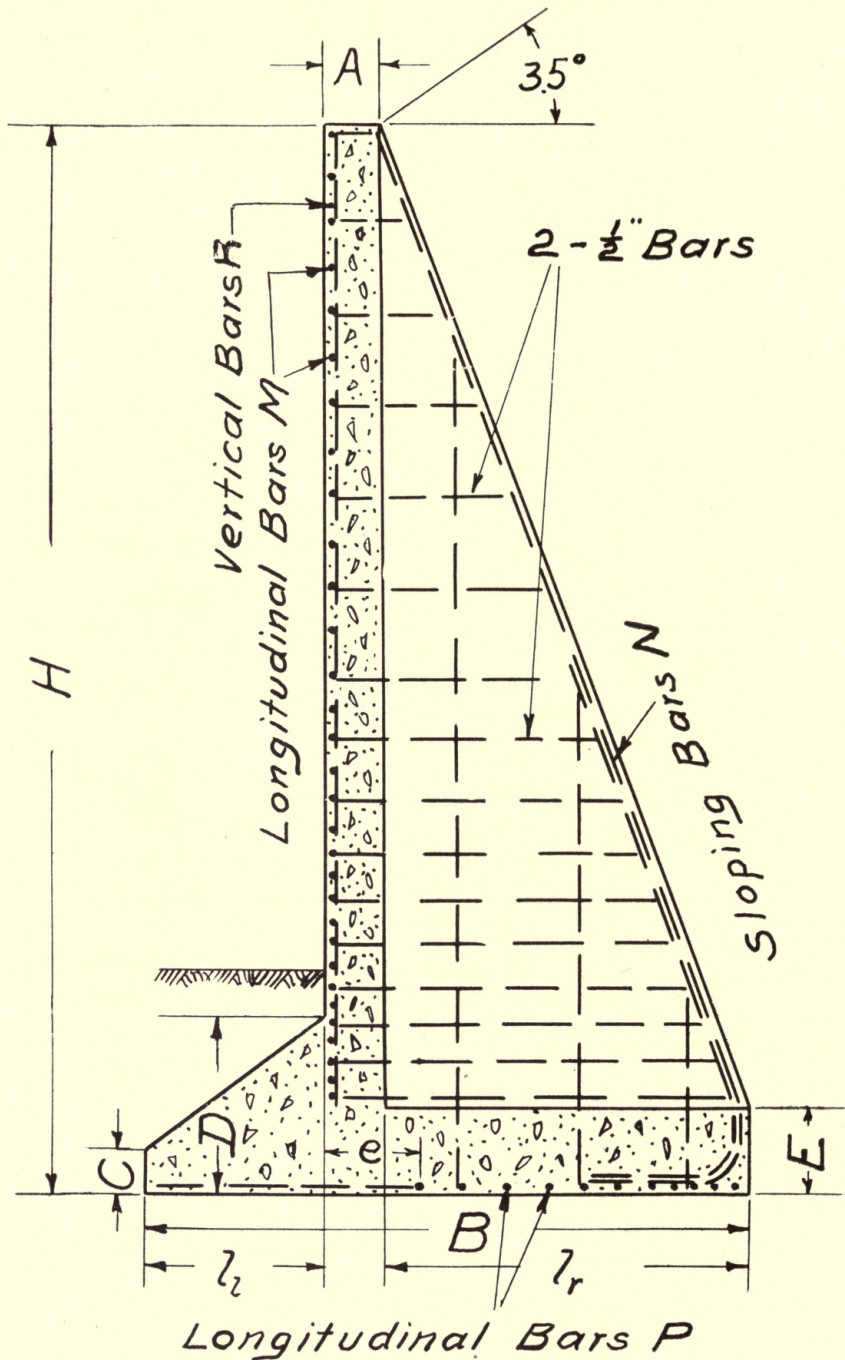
DESIGN OF COUNTERFORT TYPE OF RETAINING WALLS.
